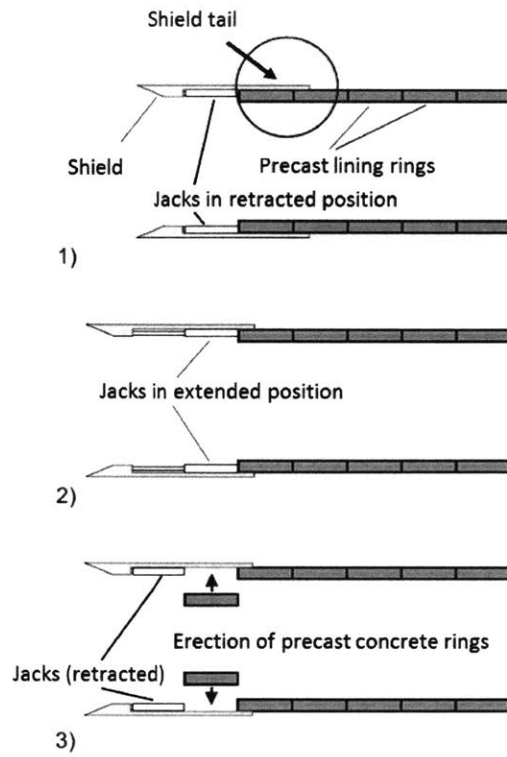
Excavation sequence for open face shield tunneling (modified from Moller, 2006)
